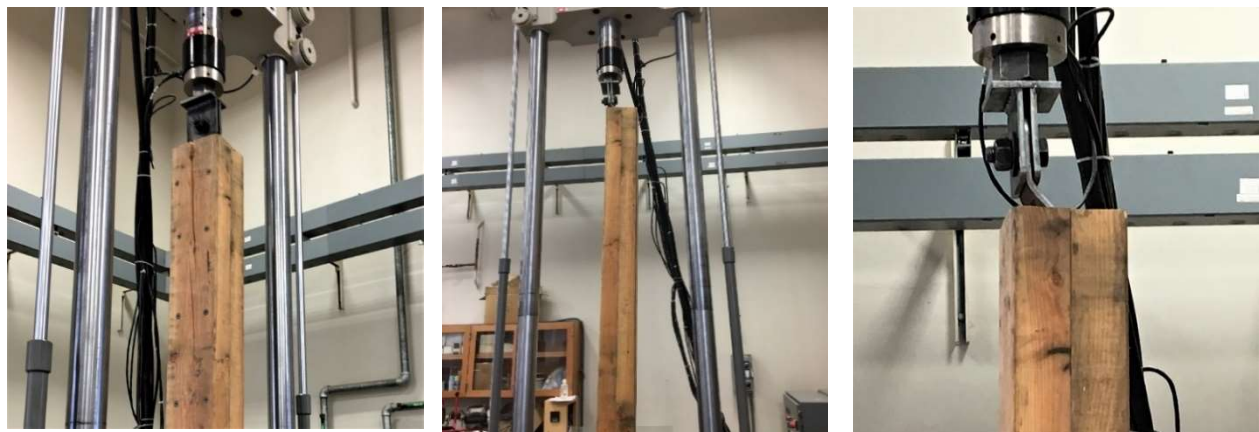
Pictures of buckling deformation, wood splitting, and connection deformation during testing
